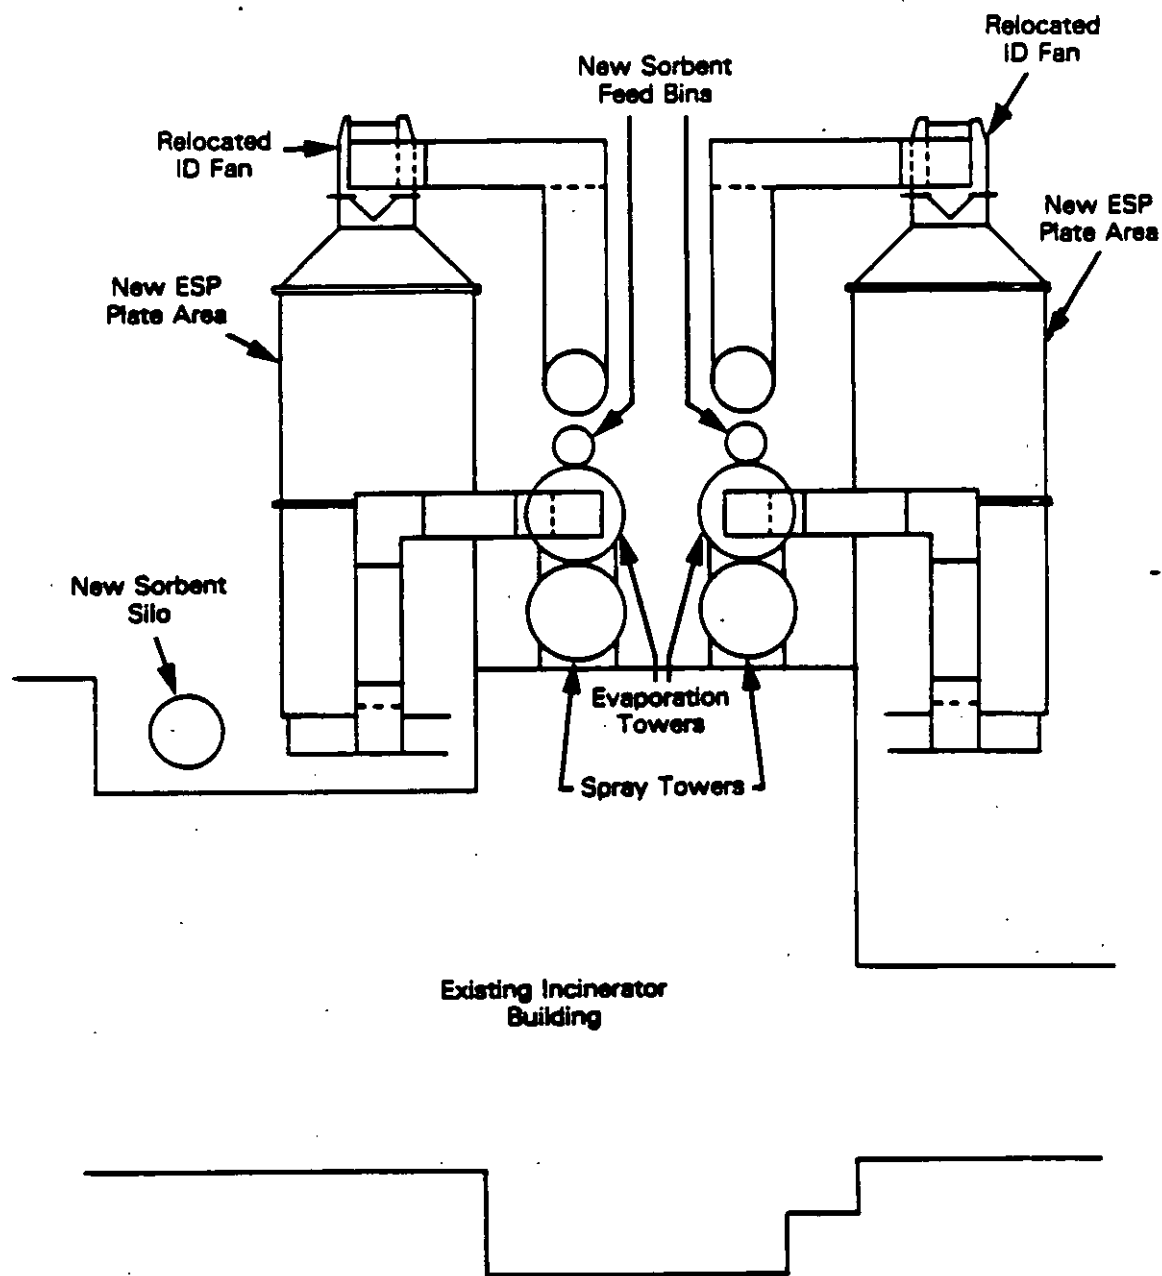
Plot Plan of Dry Sorbent Injection Retrofit Equipment Arrangement.
